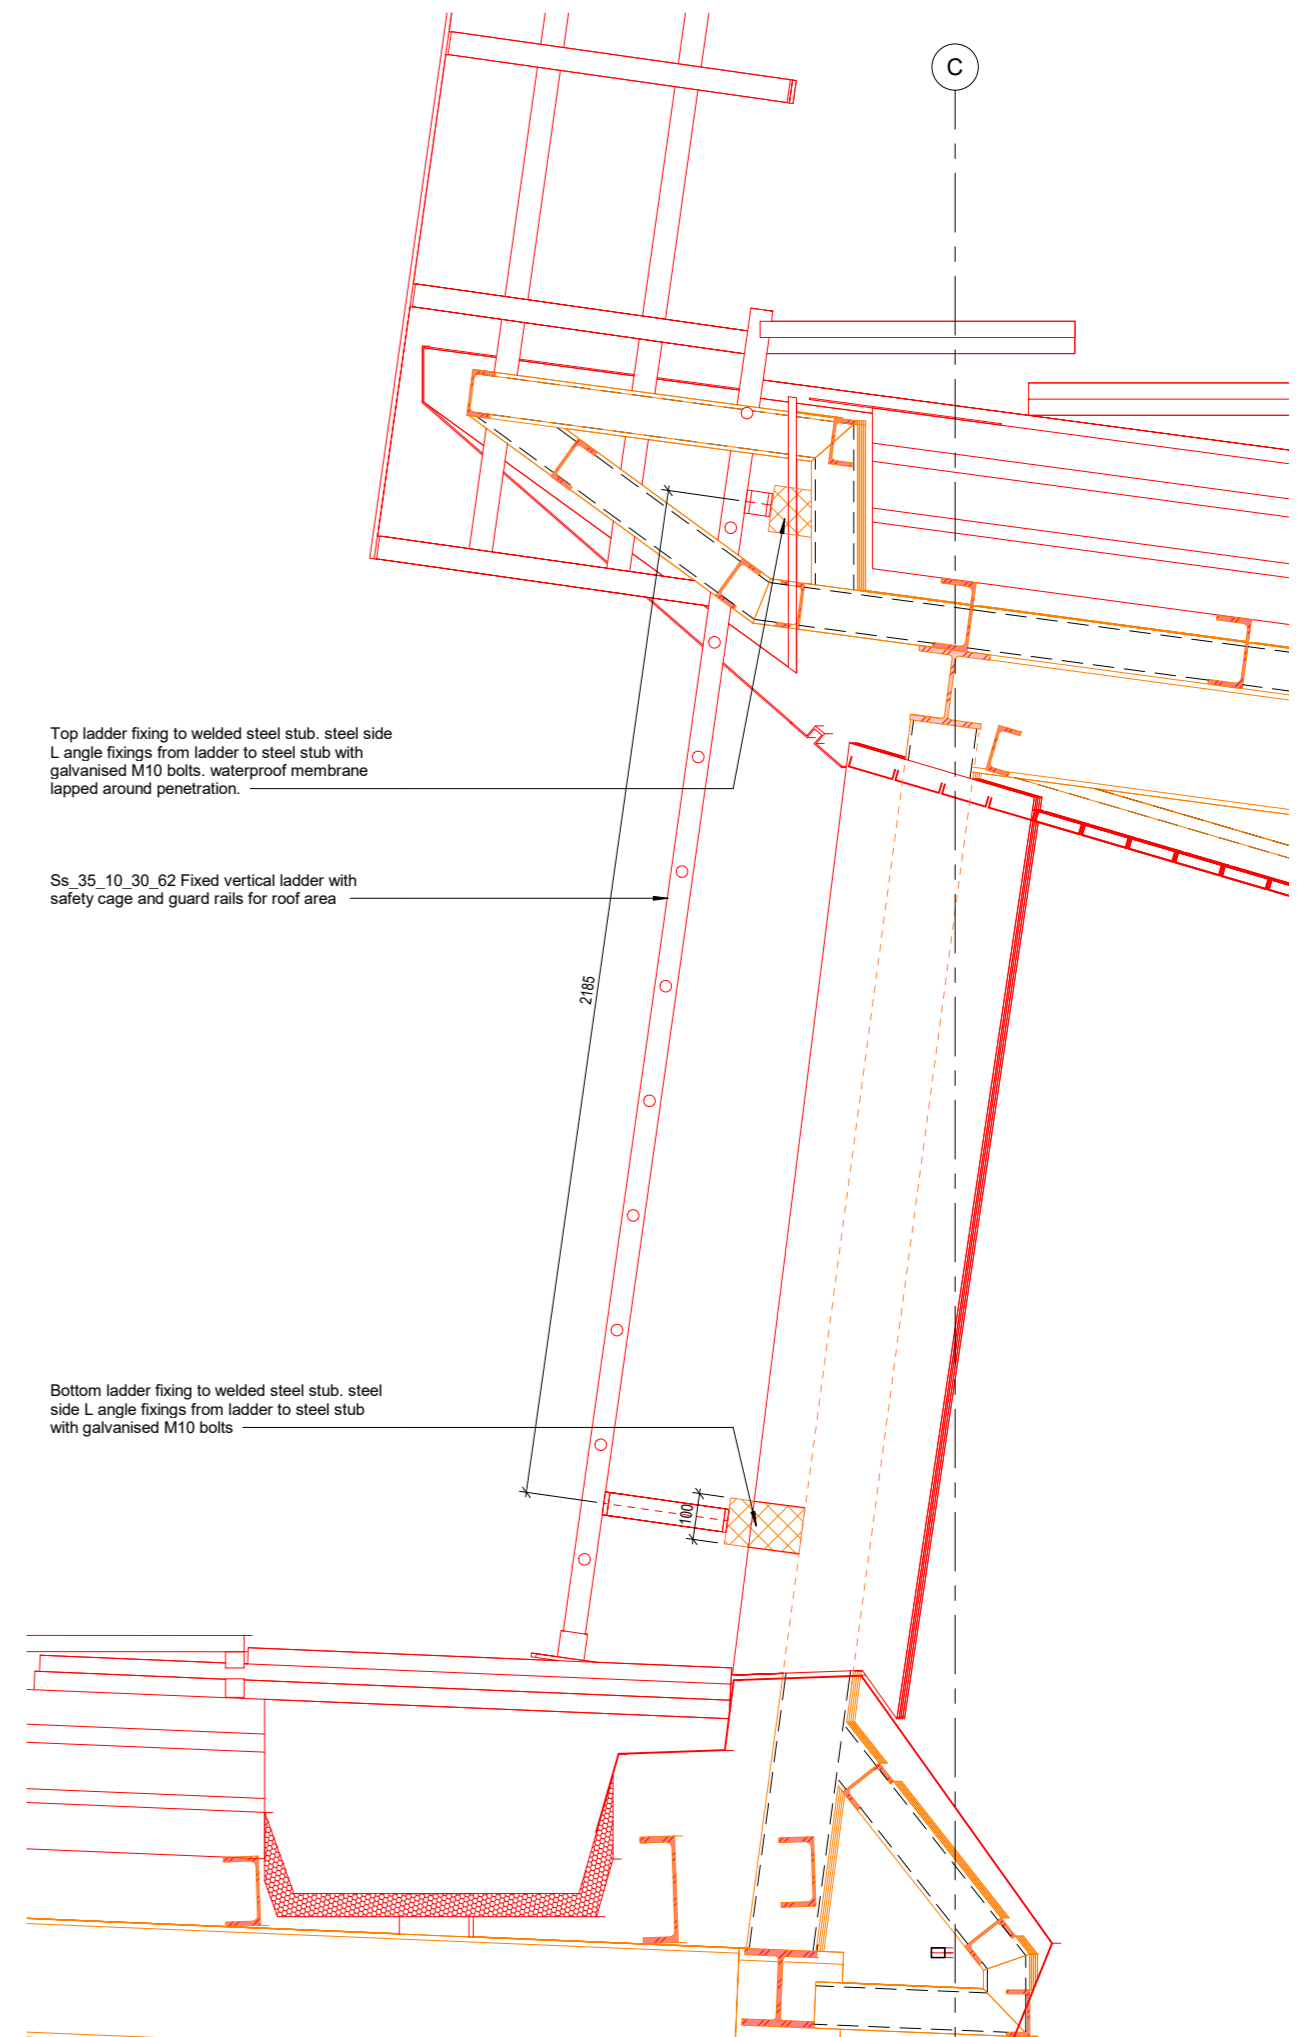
Roof B & C section showing access ladder at clerestory zone
